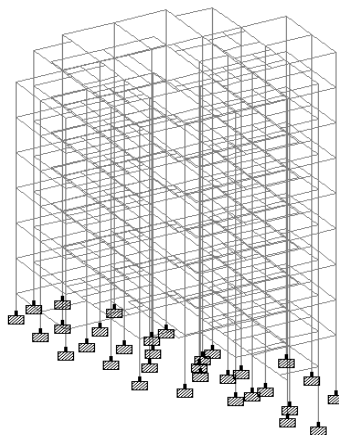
3D model of Stepback building on sloping ground in Staad Pro V8i.
